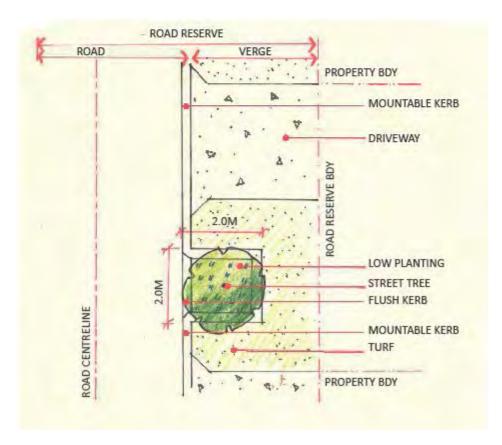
Typical layout plan – no footpath (Scale 1:50@A3)
